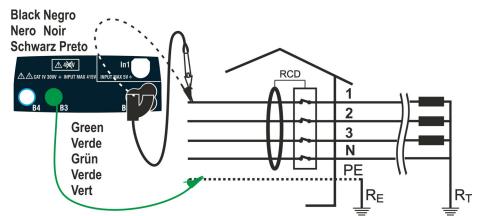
P-PE 2-wire test for three-phase with single cables and remote probe
